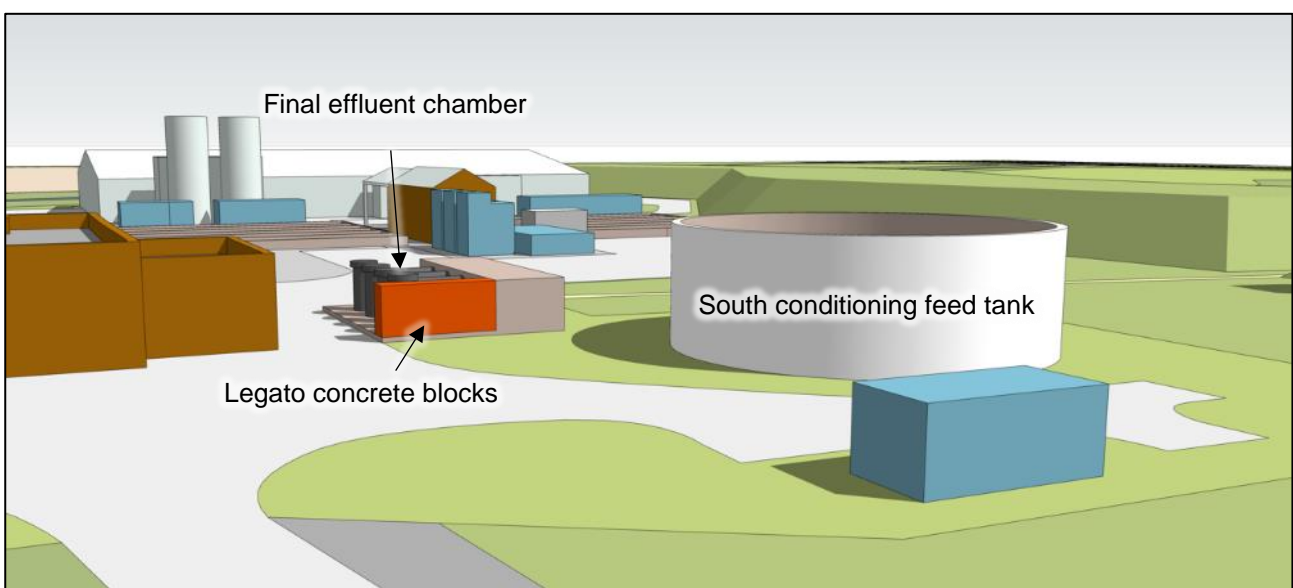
South conditioning feed tank surge containment concrete wall solution.
